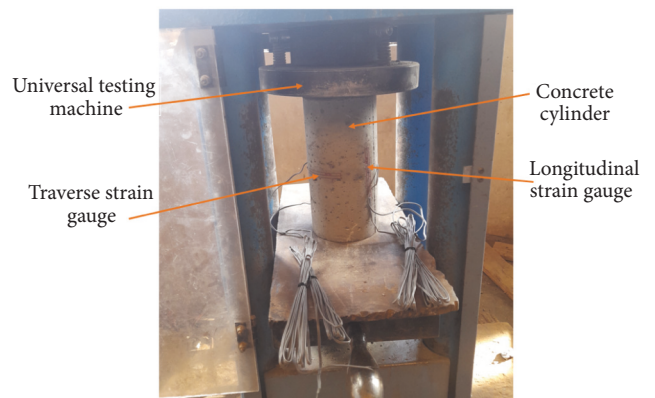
Test setup determination of static Young's modulus and Poisson's ratio of concrete.
